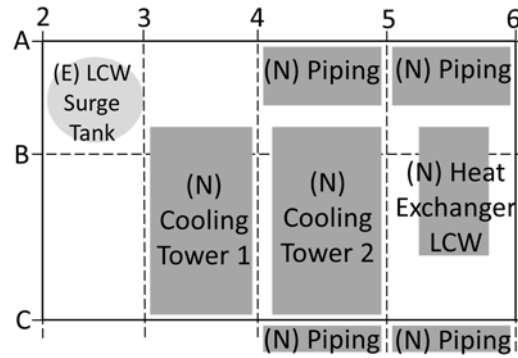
Equipment Layout on Roof: New (N) Work (Bascoul et al. 2017)
